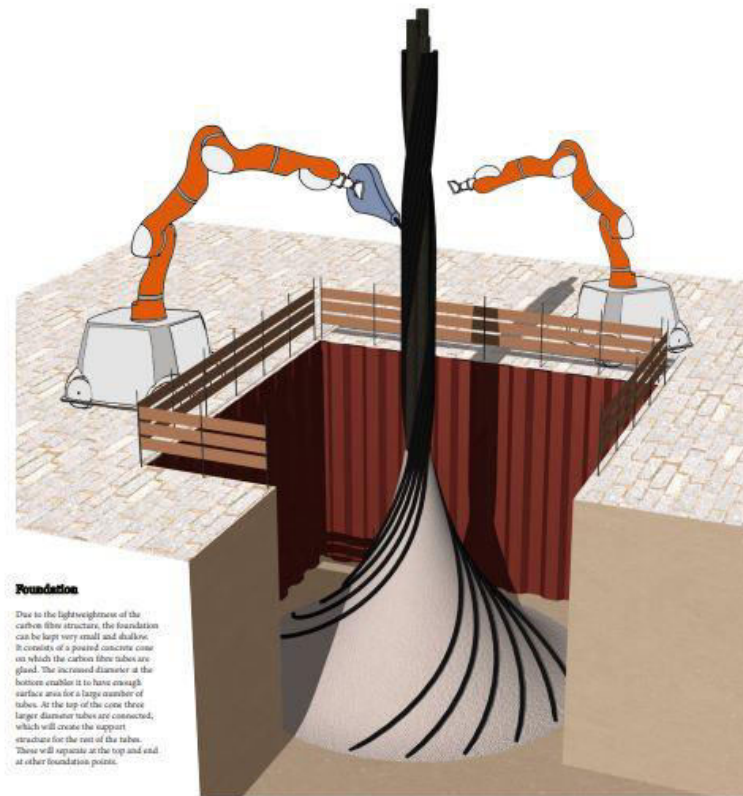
Concrete cone foundation and glued tubes (Volmer, n.d: online).
